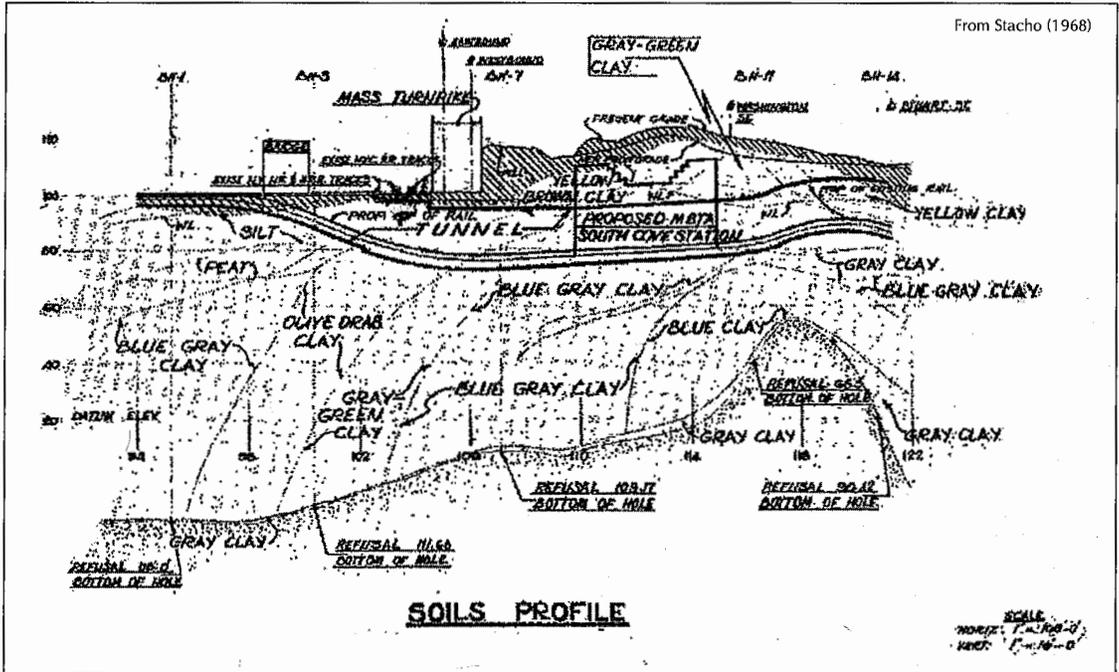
Section of the Southwest Corridor Tunnel near the South Cove Station at Follen Street.
